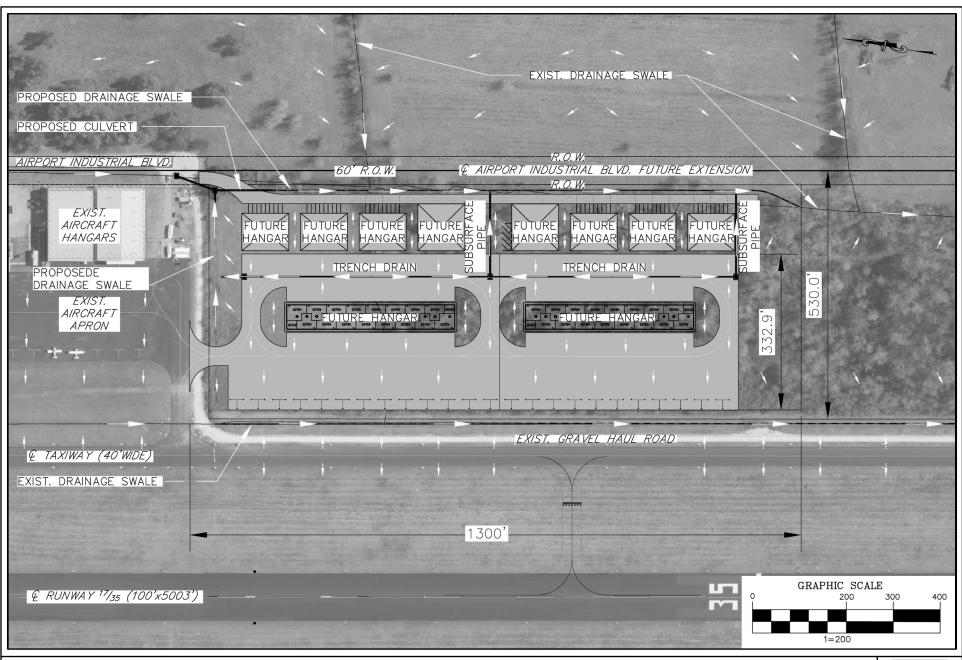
Proposed Drainage Plan Gonzales Airport 404 Permitting Department of the Army Ascension Parish, Louisiana
